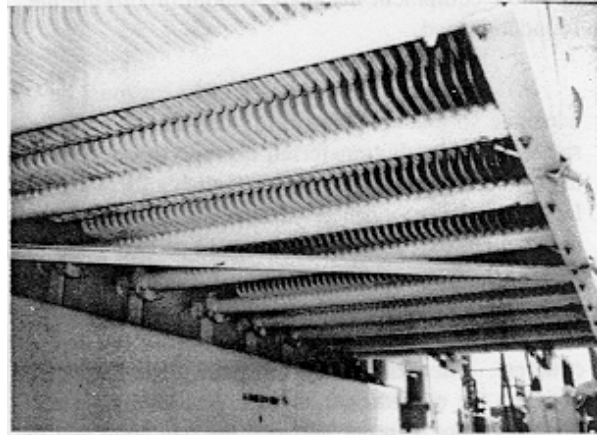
Individually supported cooler elements. Each cooler element has its own transformer case penetration which also serves to support the cooler. Flange leaks have not been observed for this type of configuration. The end of the coolers which is most distant from the transformer body is also restrained by a small angle iron brace
